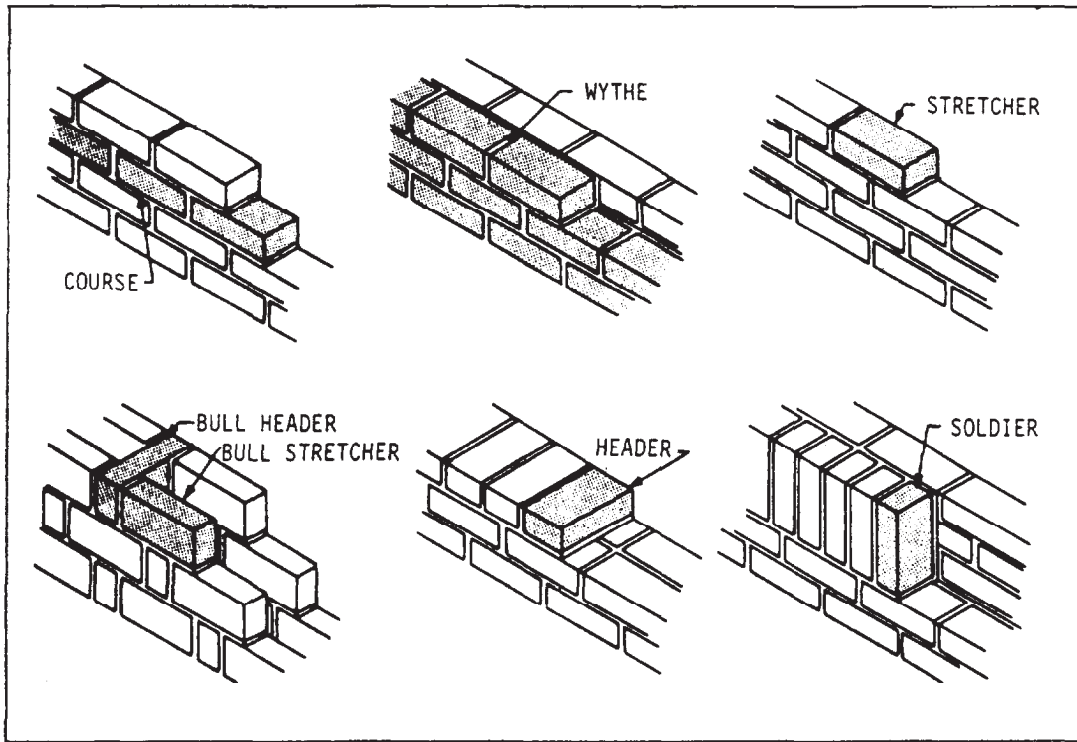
Various positions of wall masonry units and mortar joints.
